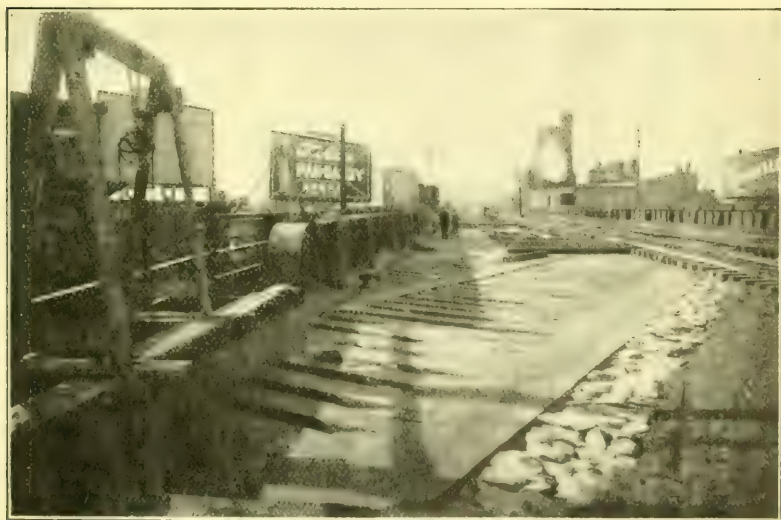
FINISHING BRIDGES, WEST SIDE.
